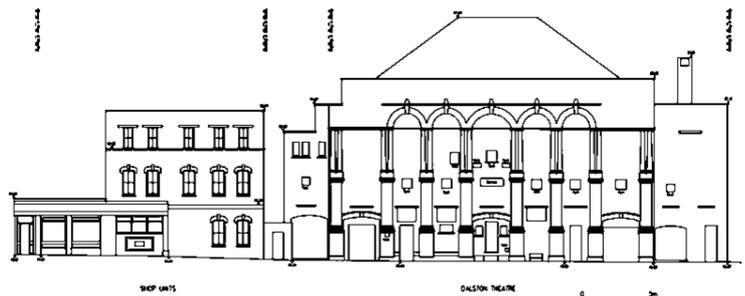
External elevation of Buildings 2 and 5 to the west on Roseberry Place (London)
